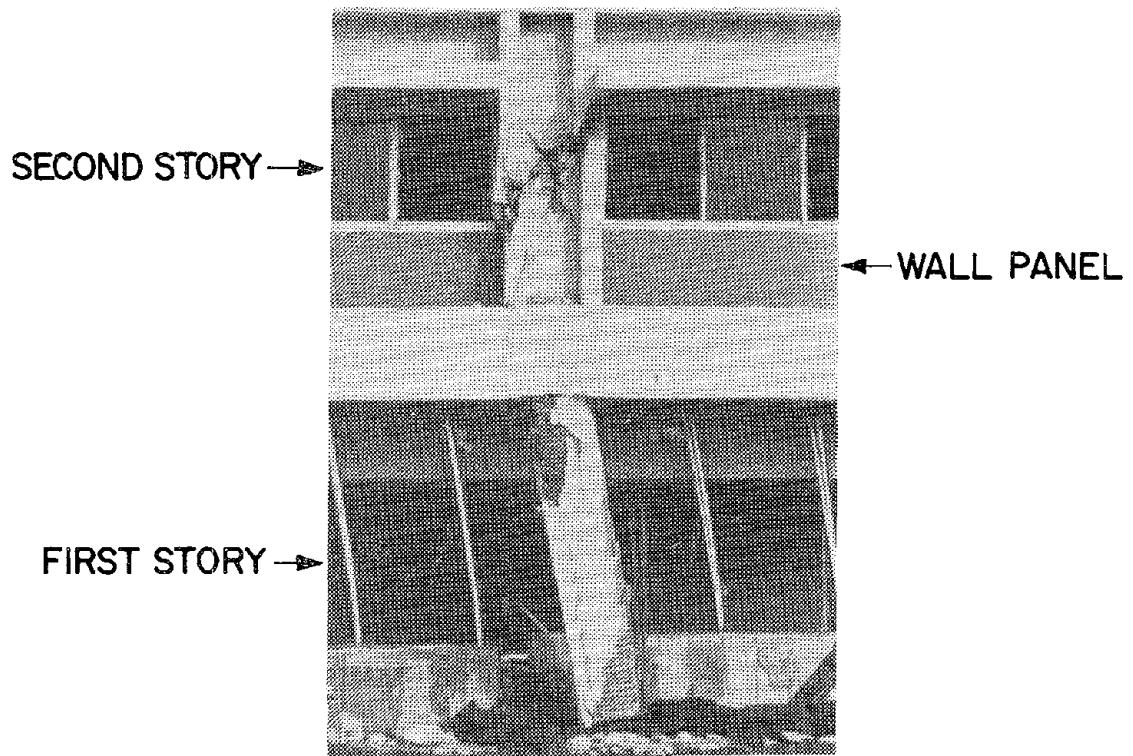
COMPARISON OF DAMAGE TO FIRST STORY SPIRAL COLUMNS AND SECOND STORY TIED COLUMNS IN UNIT A (J-7). NOTE SEVERE NONSTRUCTURAL DAMAGE.
